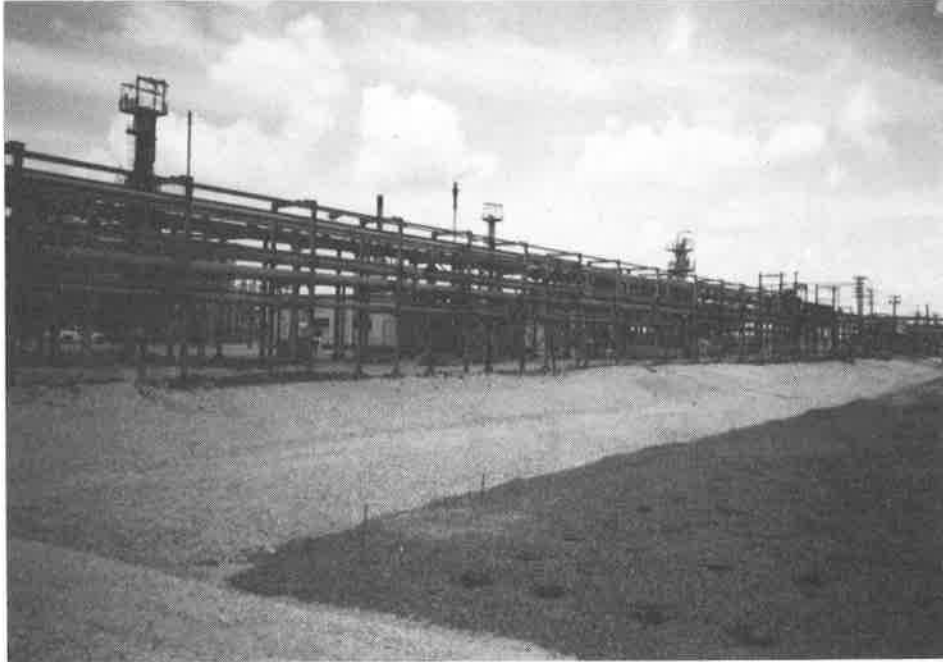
Hydrotreater Unit after piles have been driven through the initial 0.46 meter (18 inch) lift of crushed concrete, just prior to uniaxial geogrid placement. Pile tops can be seen in foreground.
